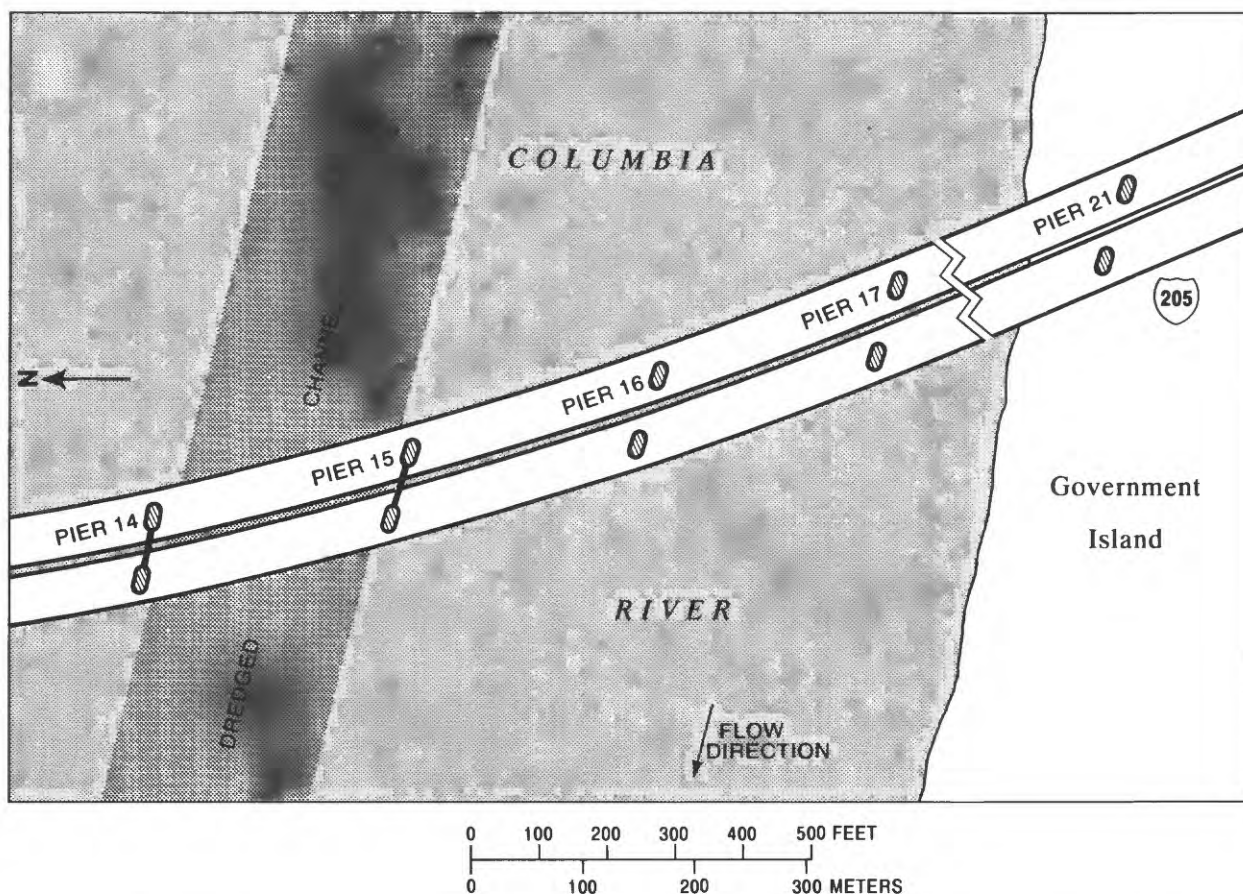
Plan view showing Interstate-205 bridge over the Columbia River near Portland, Oregon.
